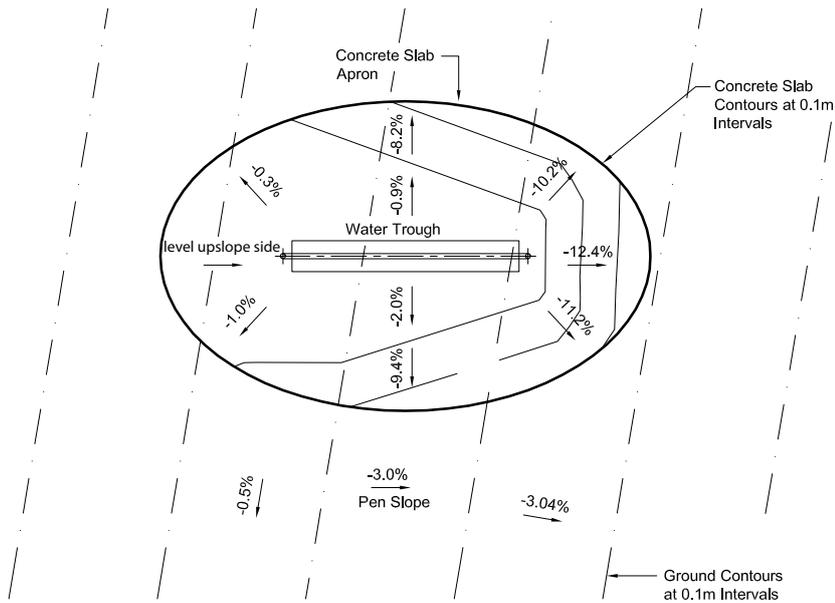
Typical concrete apron long-section details with 3% downslope in pen
